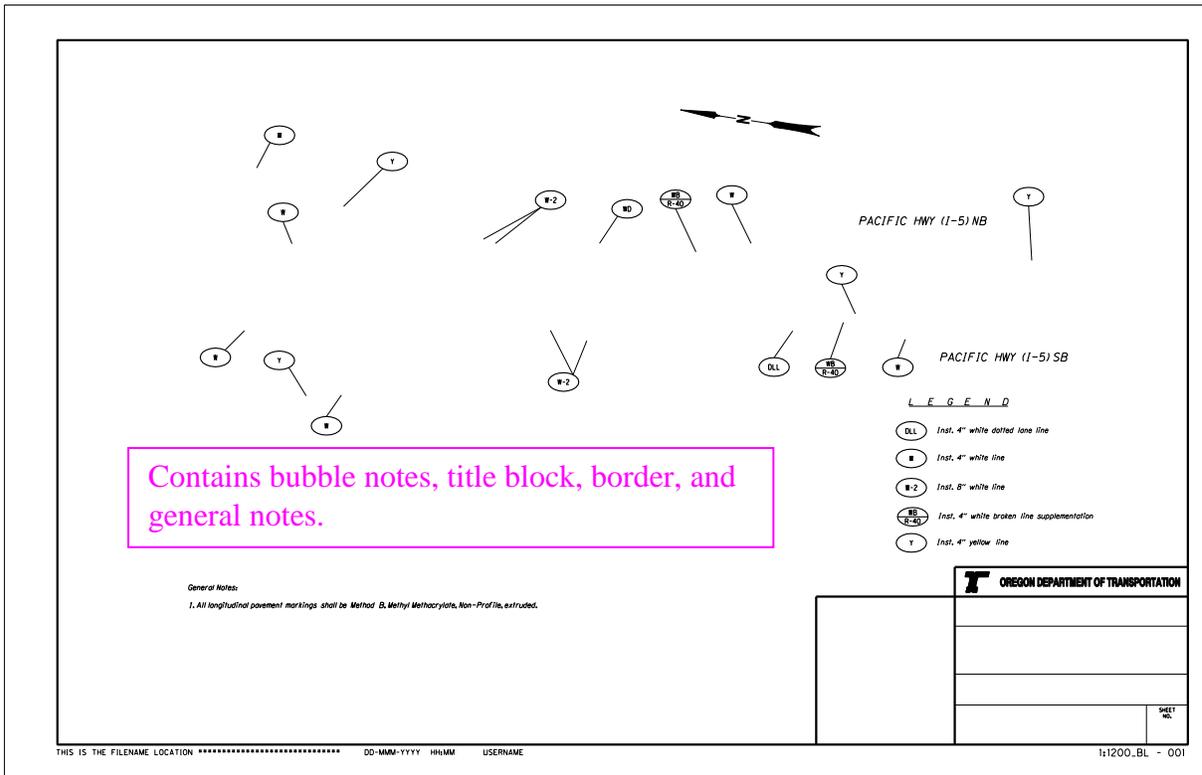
Pavement Marking Plan Sheet File Example Without Design File Referenced
